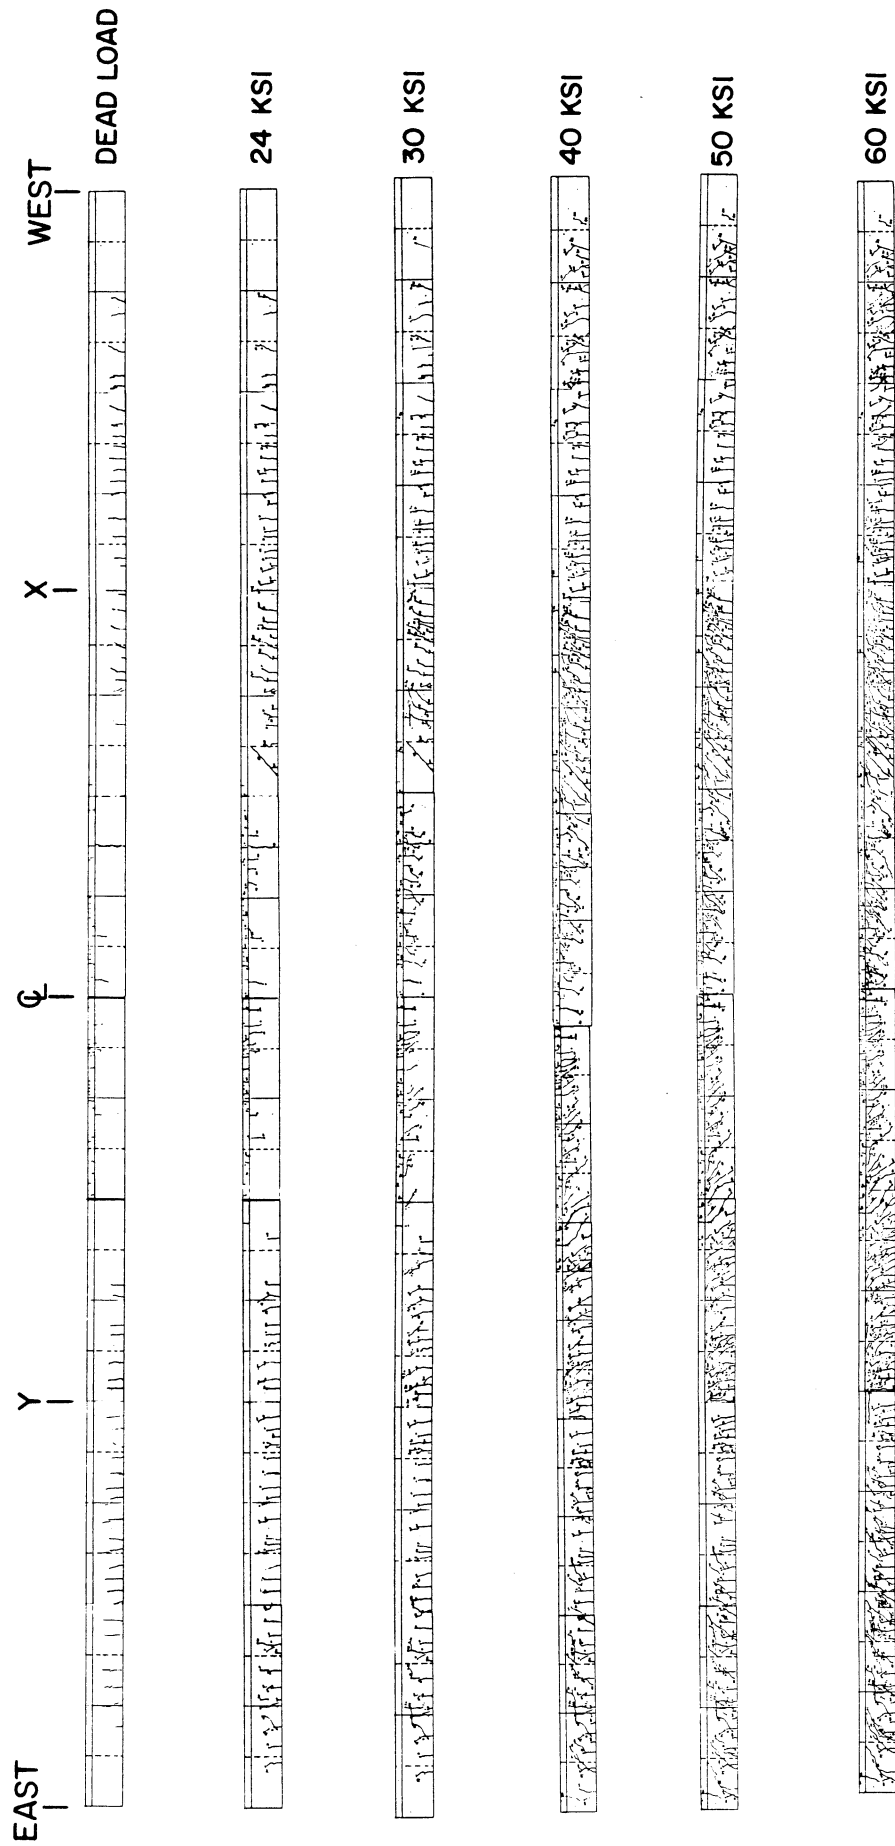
CRACK HISTORY FOR OUTER GIRDER 5 (NORTH FACE)
